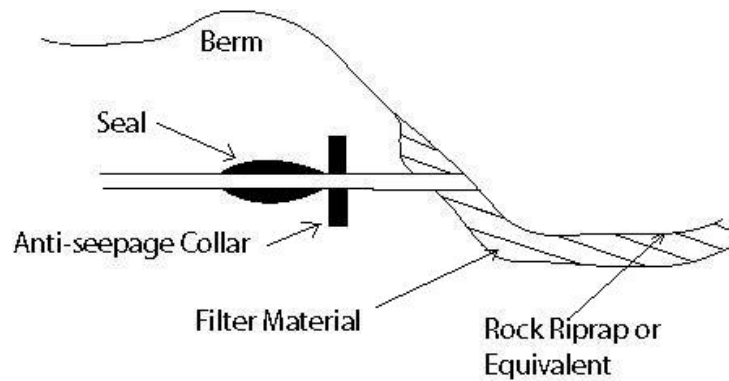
Typical tile drain outlet (Ontario Ministry of Agriculture Food & Rural Affairs (OMAFRA), 2008)
